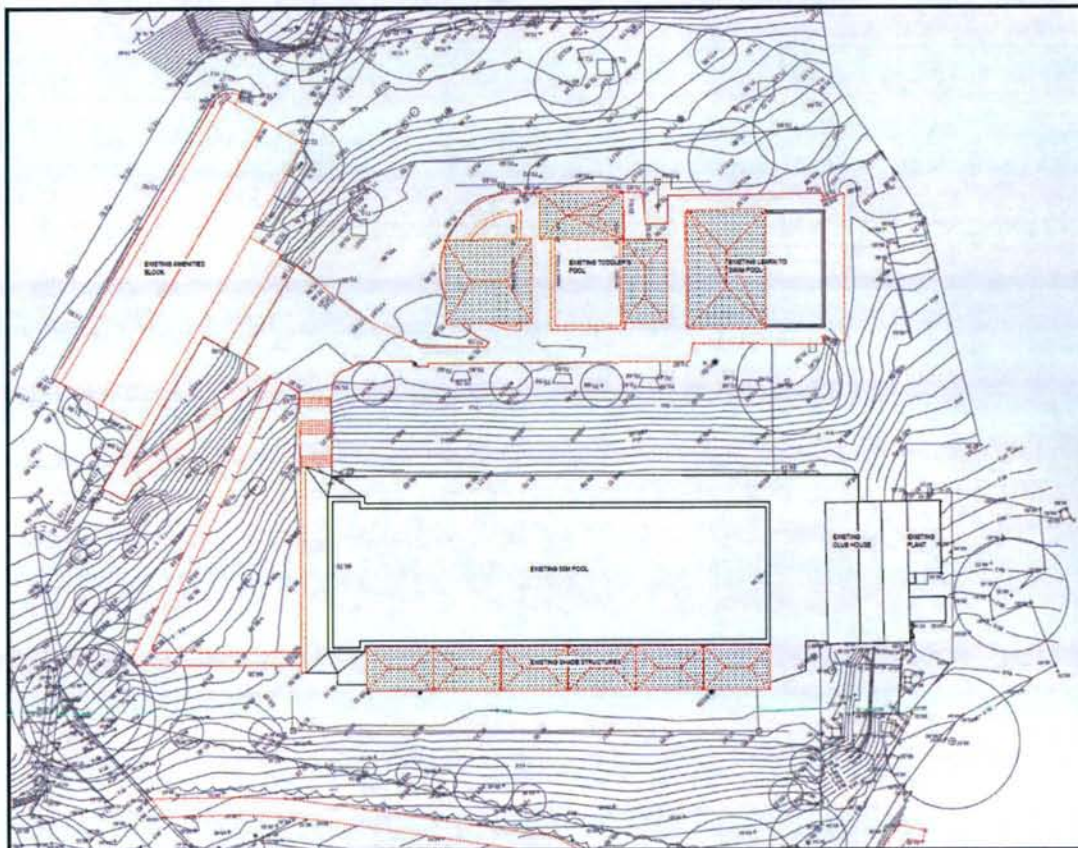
West Pymble Swimming Pool Site Plan (Existing)
